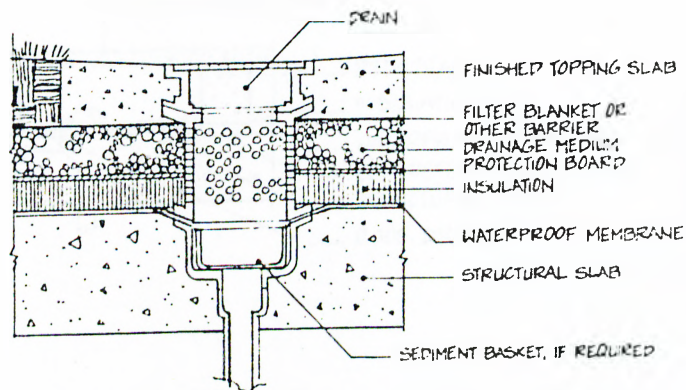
Drains for Paved Areas near Planting Beds. For drains in paving near an area of planting medium, topping slab is installed directly on the drainage medium after filter blanket is first placed to prevent loss of wet concrete into the drainage medium.
